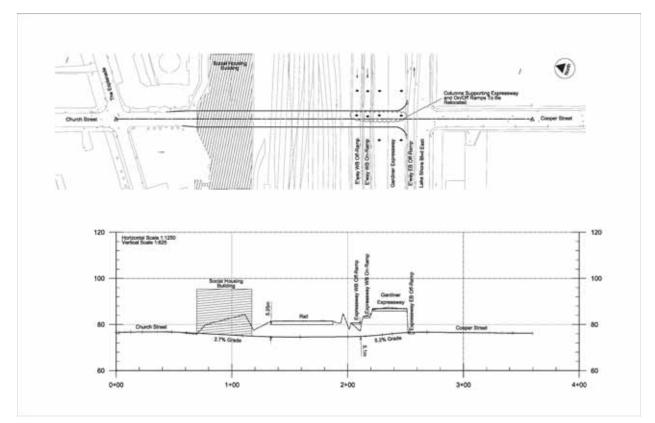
Conceptual Design of Cooper Street Connection to Church Street
